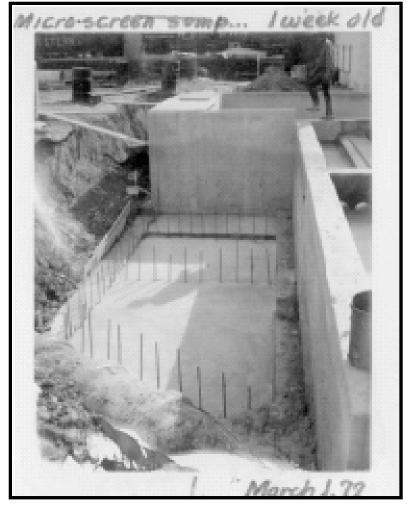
March 4, 1972 photo. View looking south from northeast corner of new settling basins.
